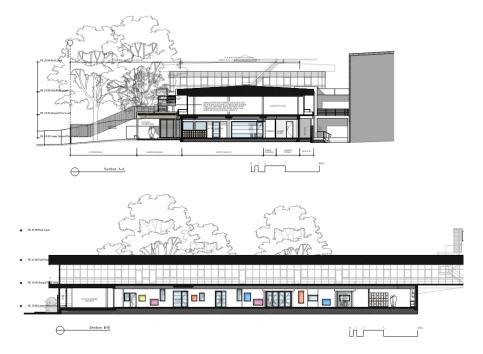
Proposed Sections (Source: ID Fitouts, 2024)
